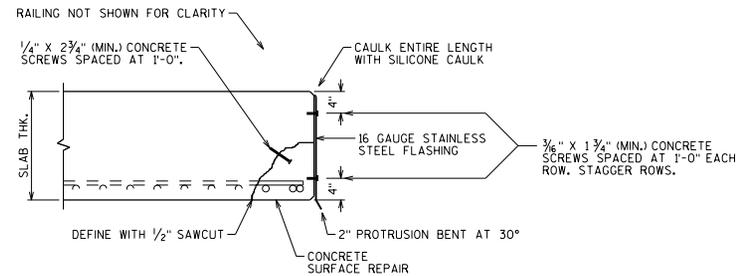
DETAIL FOR CONCRETE SLAB BRIDGE SIMILAR
